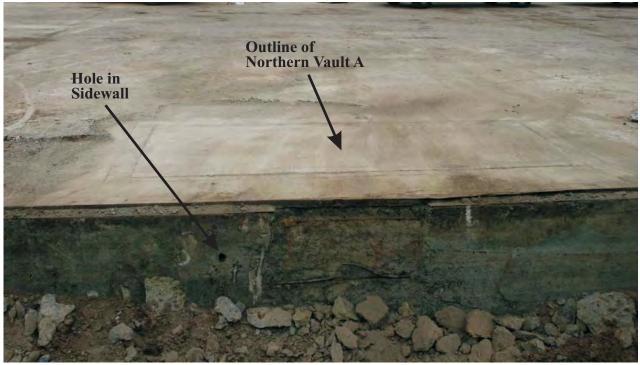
Outline of Northern Vault A (hole in northern sidewall of Frog Pond connected to sump).
